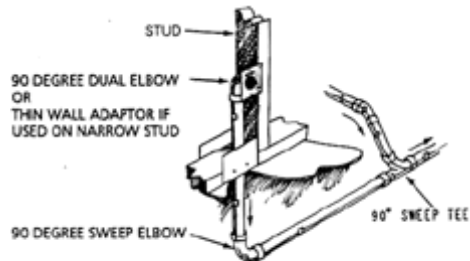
TYPICAL UNDER-FLOOR INSTALLATION
